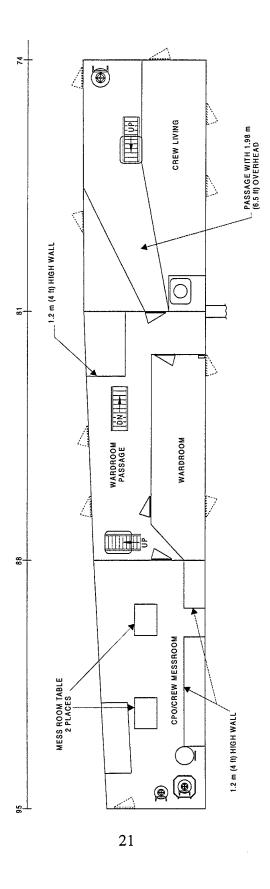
Plan view of modification to second platform of SHADWELL/688
